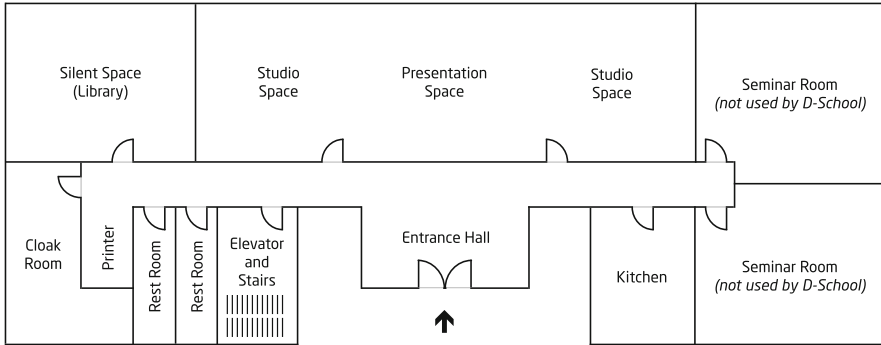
Floor plan, ground floor, HPI D-School Potsdam (schematic)
